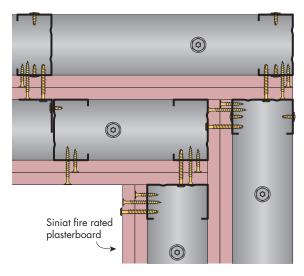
Wall Internal Corner Fire rated from both directions Built from one side only - Plan
